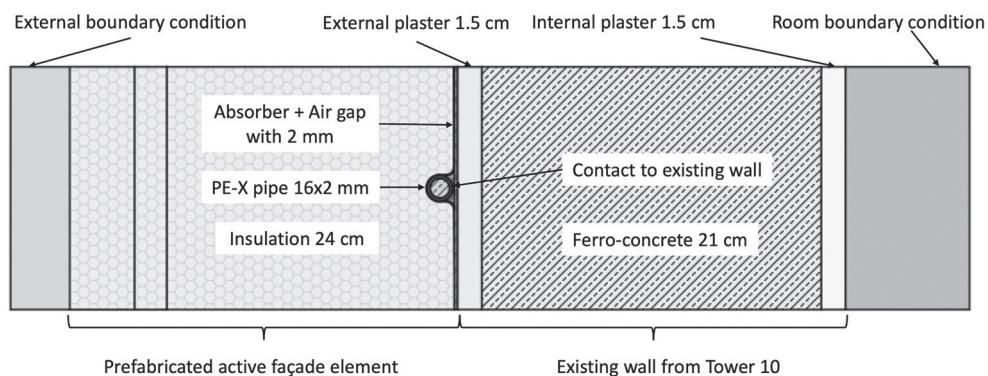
Construction of the prefabricated active façade element with FC (Hengel et al. 2020)
